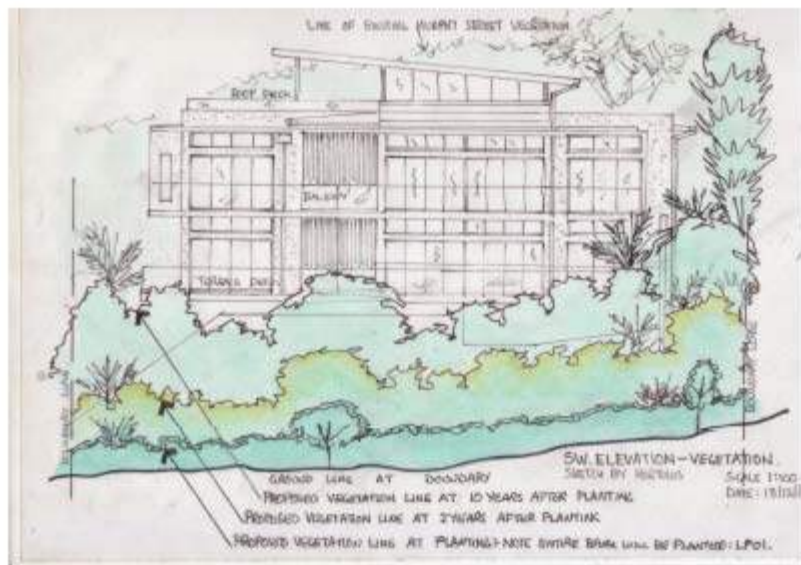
South West Vegetation Elevation at planting, 2 years and 10 years.
